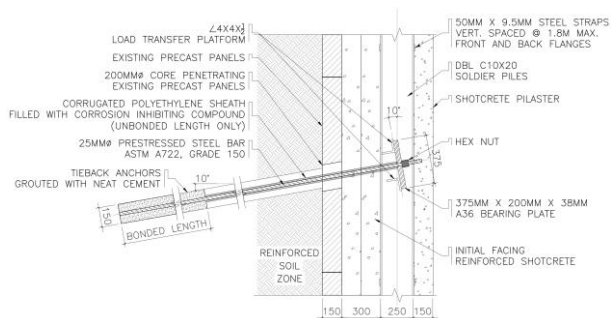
MSE wall retrofit using prestressed anchor, shotcrete facing, and soldier pile construction: section view.
